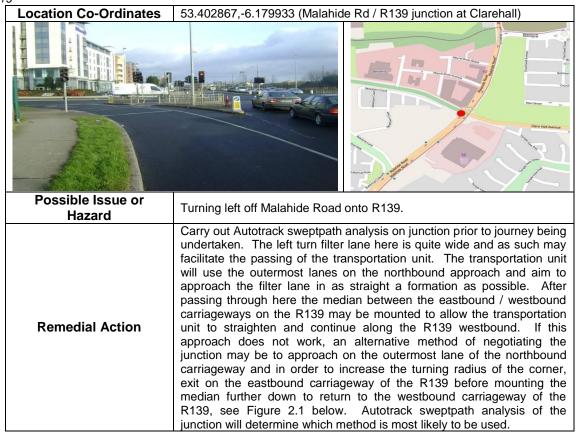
Looking east along R139 towards exit of Clarehall Junction
